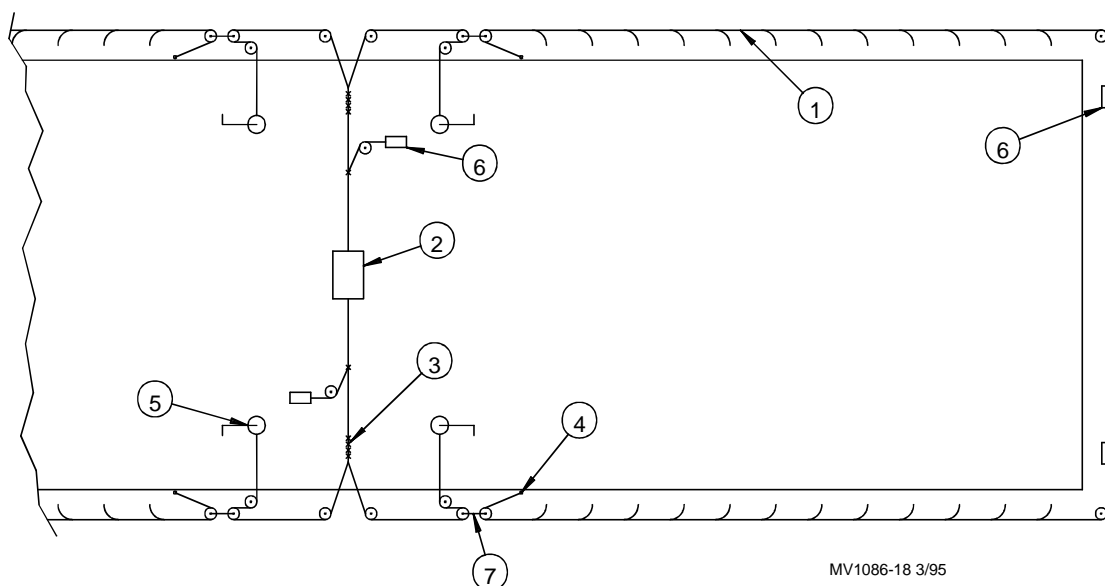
through 12 provide guidelines for cable routing and component locations. Primary components are noted on each individual application layout drawing.
